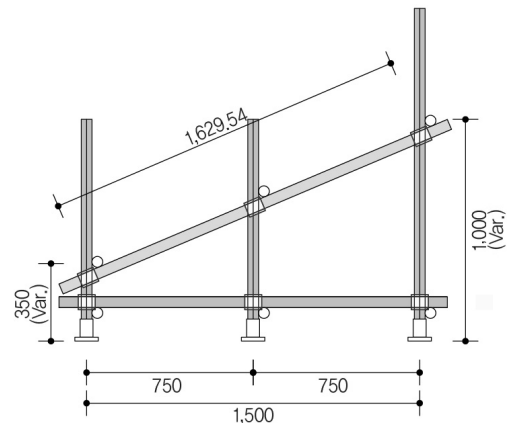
Adjustable angular support for drill casing (unit: mm)
